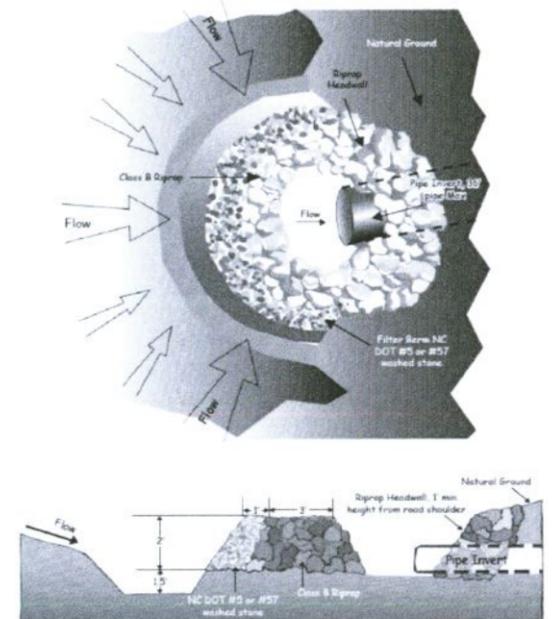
Rock pipe inlet protection plan view and cross-section view
